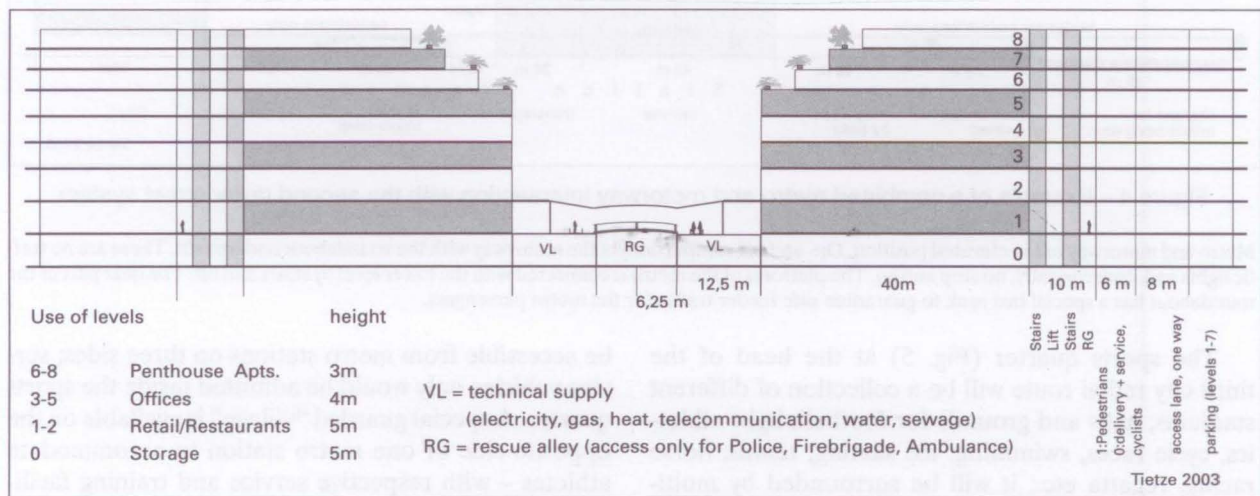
Elevation of business buildings and attached parking garages along the boulevards of the city core
